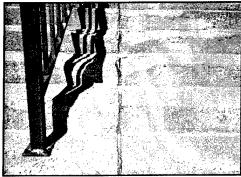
These deteriorated stairs are aesthetically damaging and a safety hazard; they must be repaired with a compatible concrete mixture.
